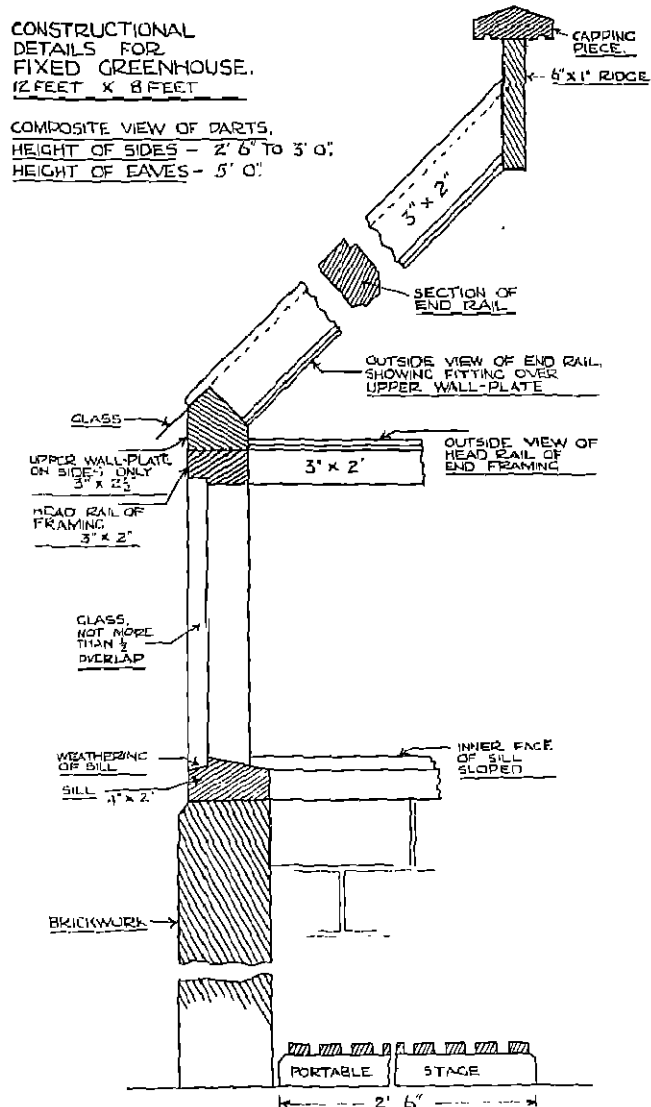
CONSTRUCTIONAL DETAILS OF FIXED GREENHOUSE
